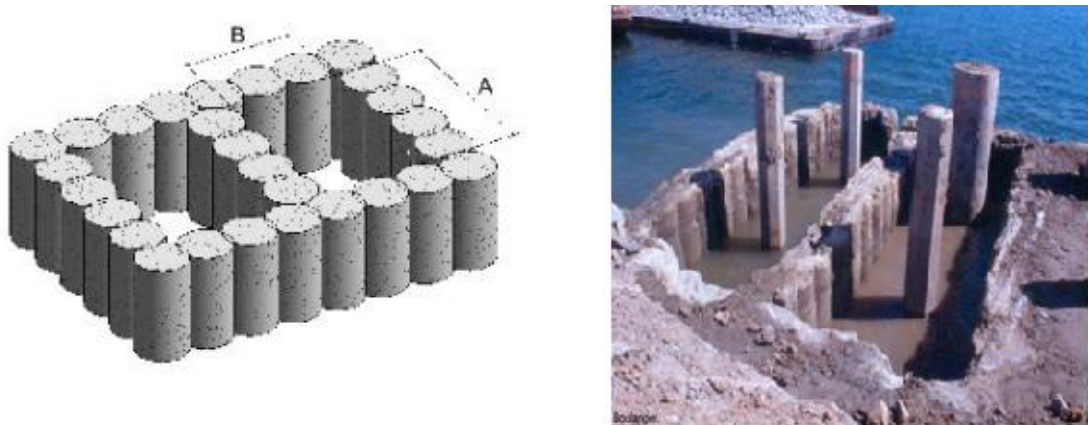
Cellular design of jet grout columns (a): plan dimension of cell, (b): an example application near the sea(Source Bolunger., 2012).
